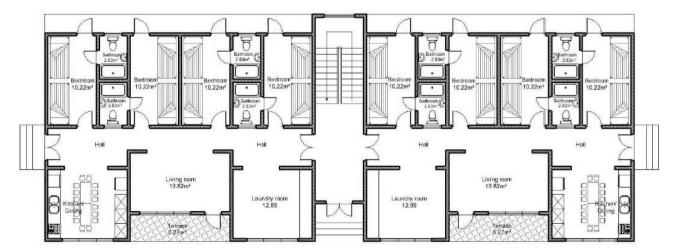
Plan of the ground floor of the building with 8 rooms per level.
